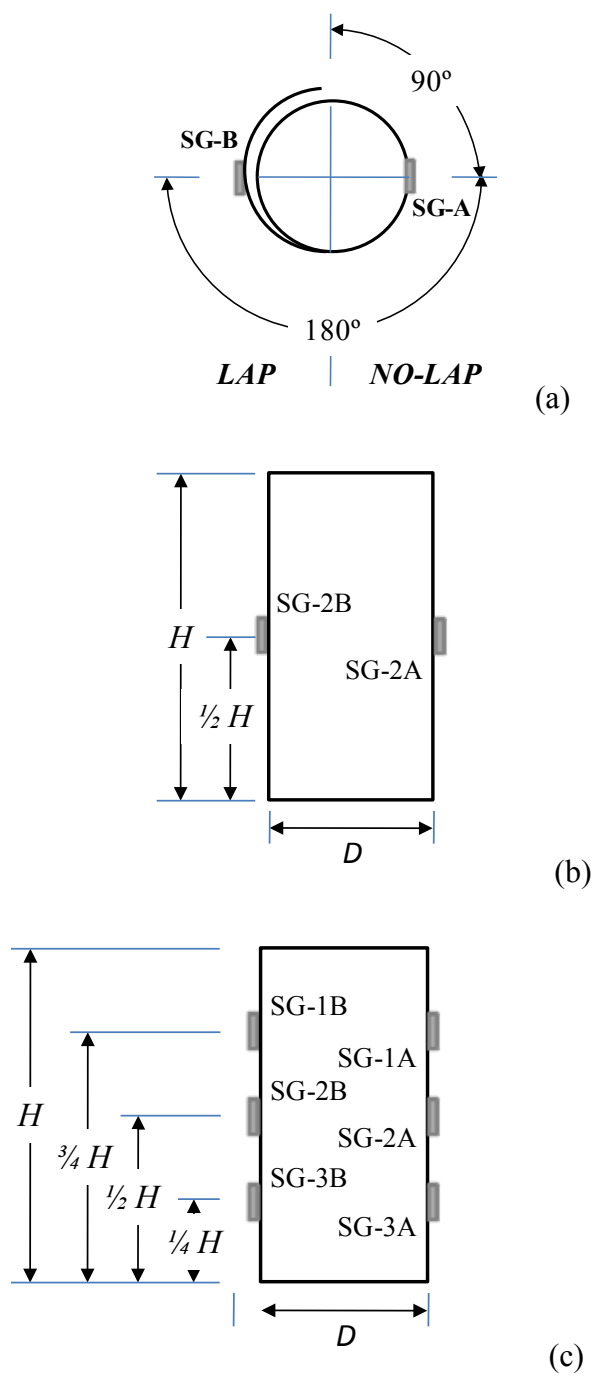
Strain gauge (SG) configuration for GFRP specimens: plan view (a); front view for layout of two SG (b); and six SG (c).
